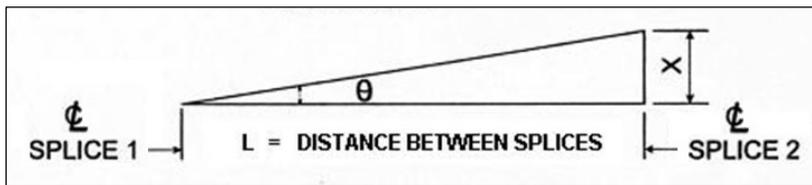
61: Calculating the Change in Beam Splice Elevation
